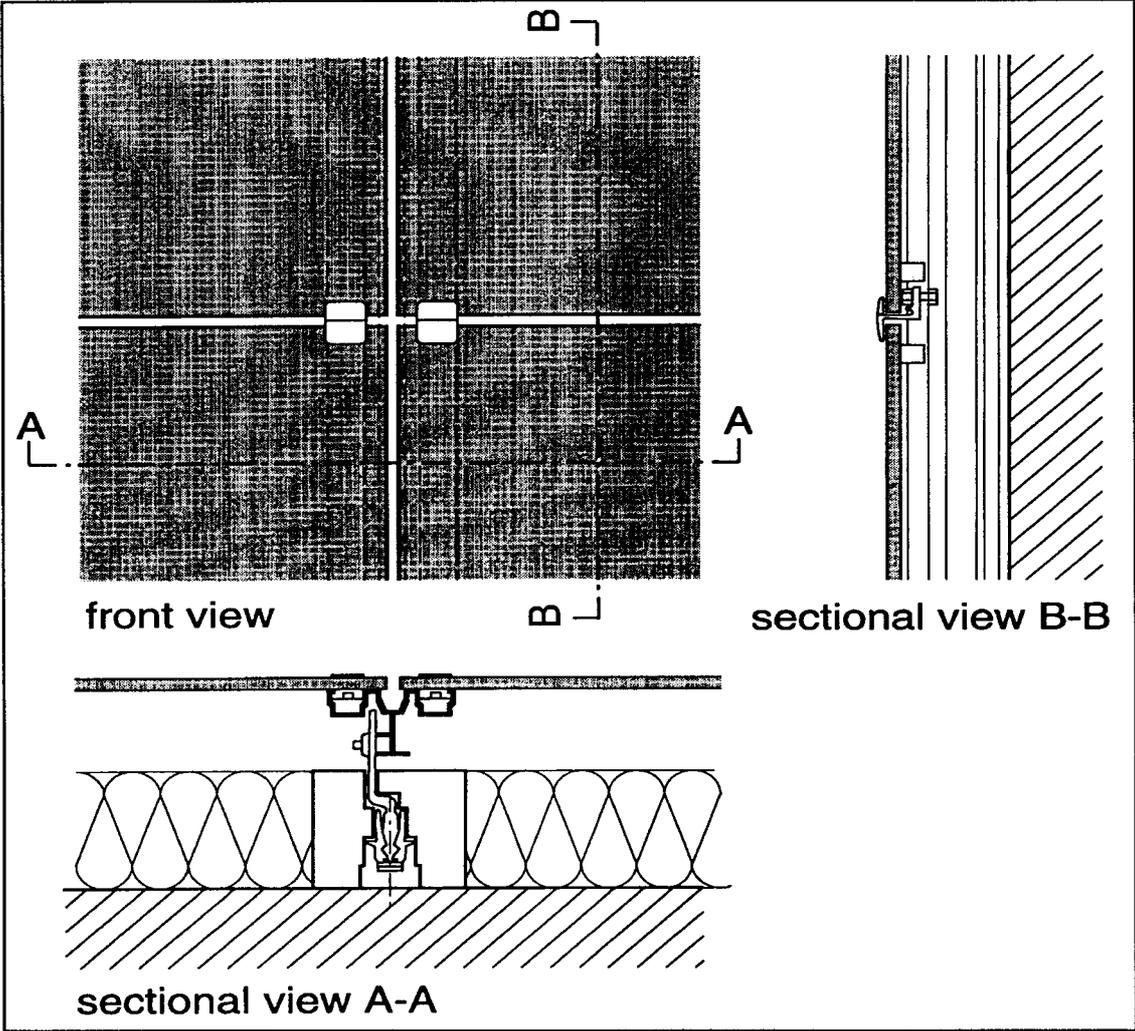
Detail drawing of ALUHIT®, a system to attach frameless PV modules on facades.
